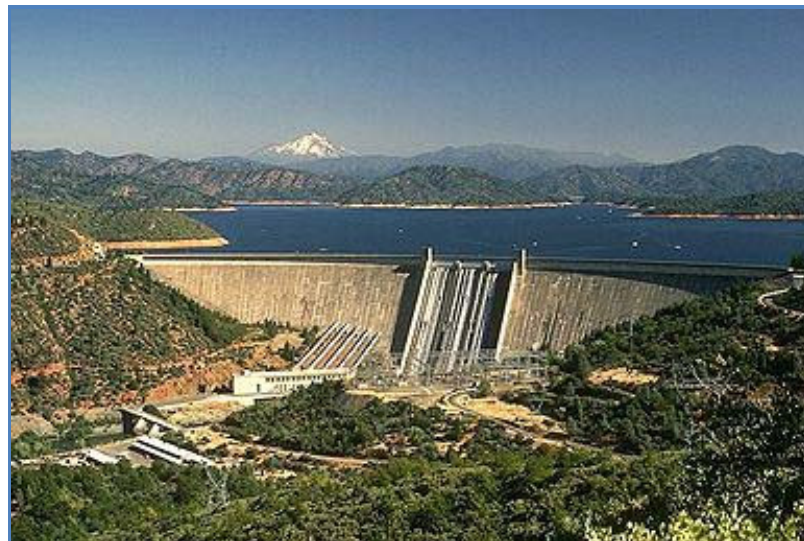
One of the first big water storage projects in the west. Shasta Dam blocks the Sacramento, McCloud, and Pit Rivers. Shasta Dam overlooks, CA (1983).
